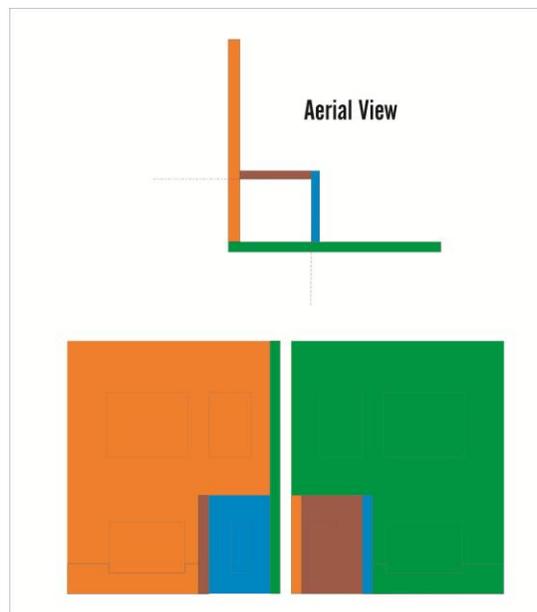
PLACE AND GLUE THE RECESSED ENTRANCE WALLS
